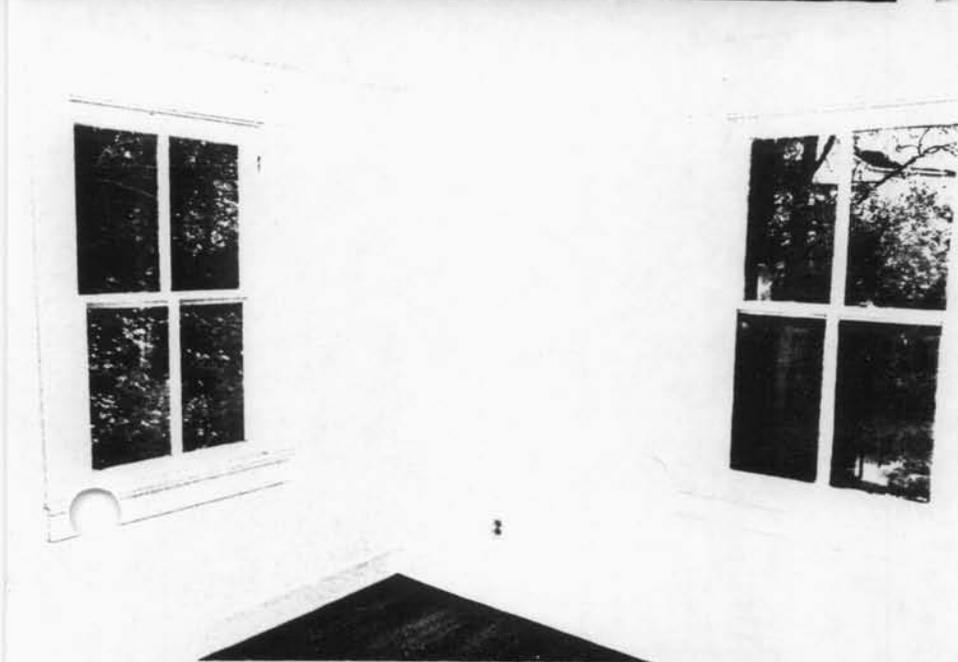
Second floor of Victorian wing--front room. Existing windows and trim restored; room restored to full size.
